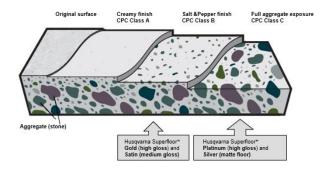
Final Polished Concrete Floor Aggregate Exposure
